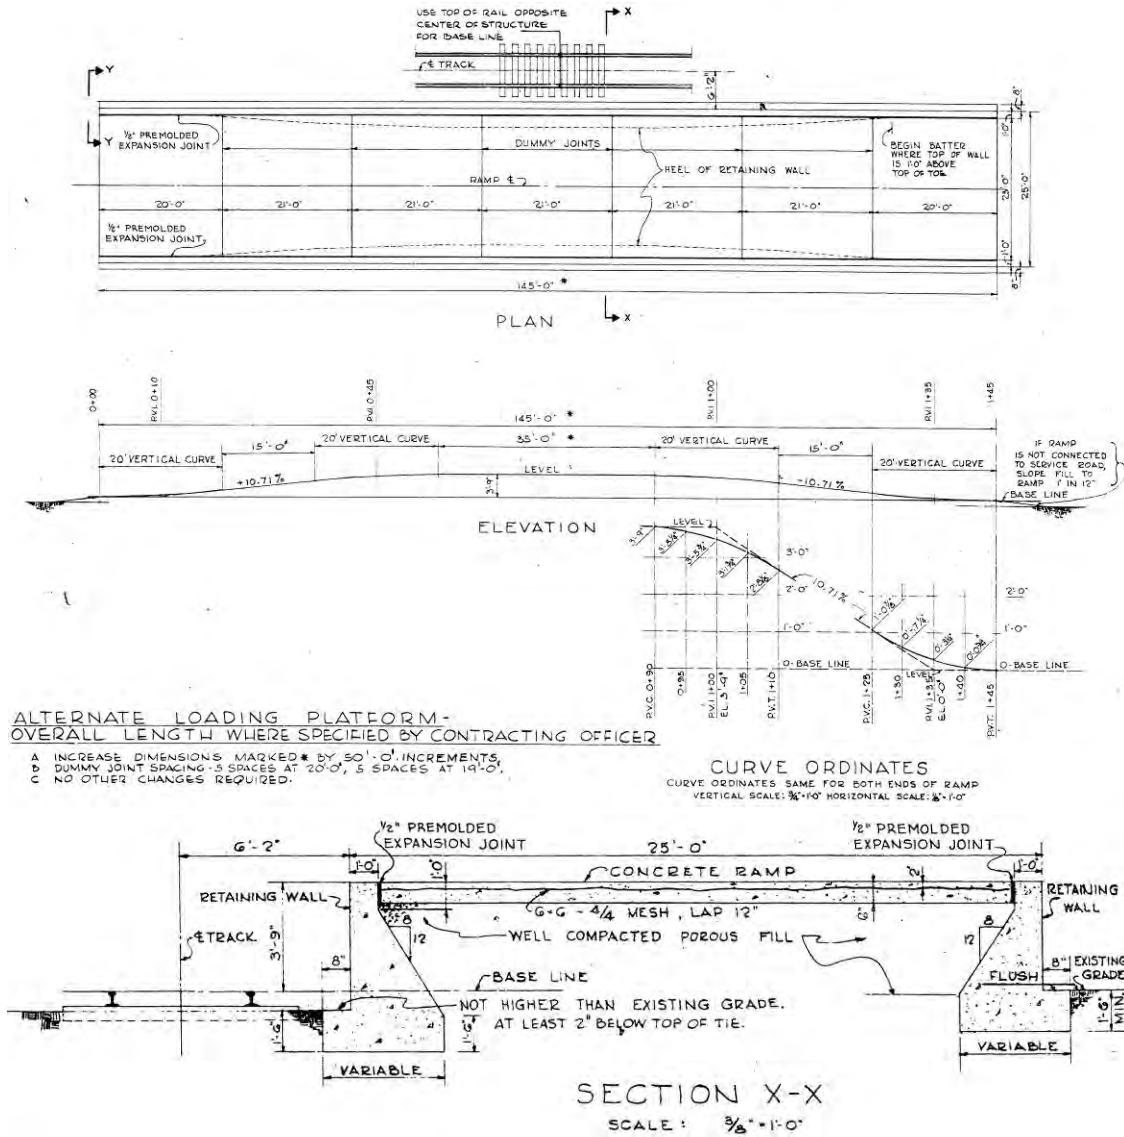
Rail movement mock-up, loading platform-side-type P-1, Fort Bragg, NC, 1952 (standard drawing 28-13-100 sheet 2 of 4; rail movement mock-up, loading platform-side-type p-1; 11 April 1952).
